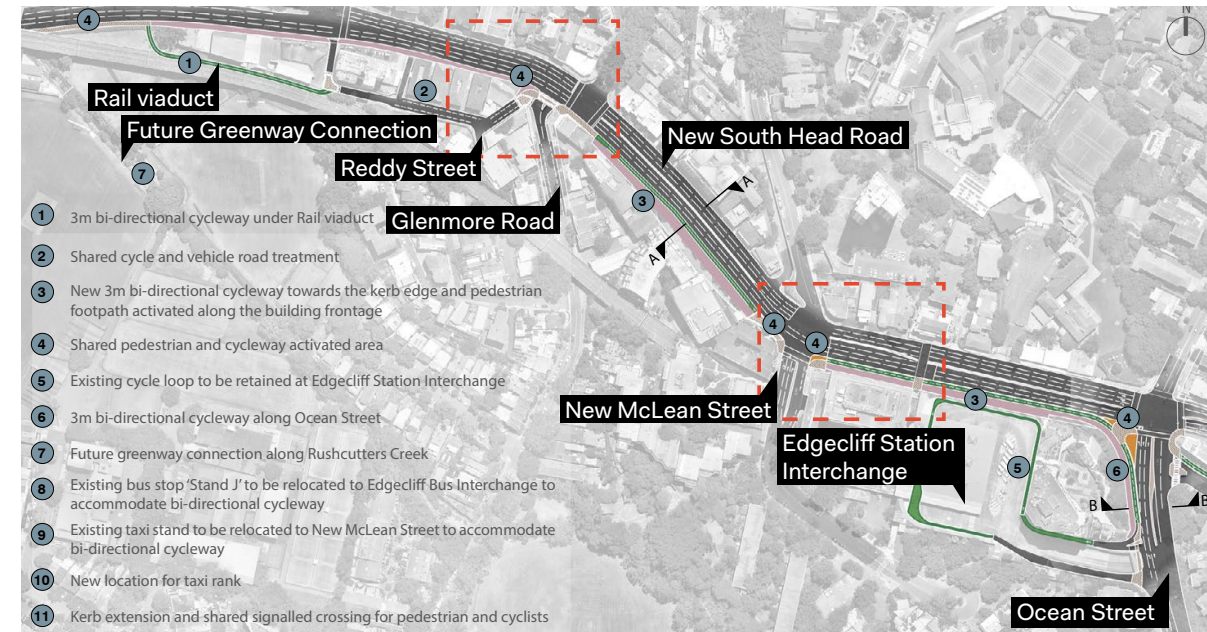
Details of Cycling Priority Project 1a (Source- Woollahra Active Transport Plan)
